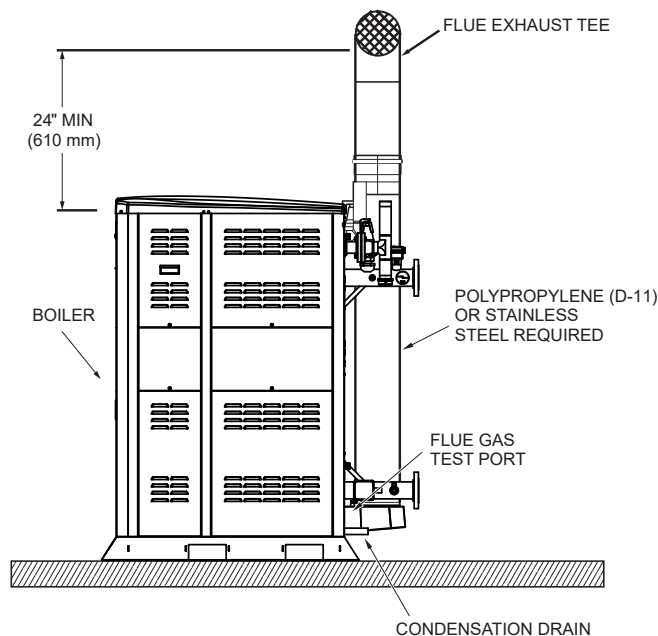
Outdoor Installation (D-11 Outdoor Vent Kit Polypro)
